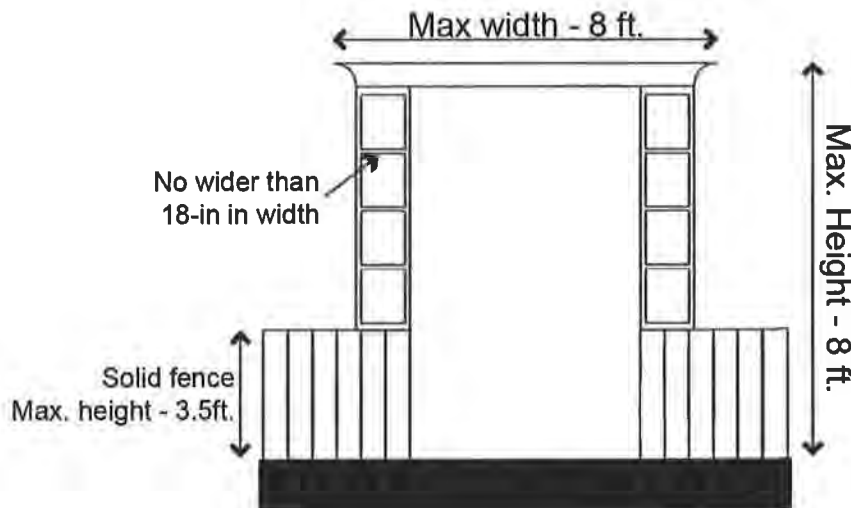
Fences on Retaining Walls Exception
